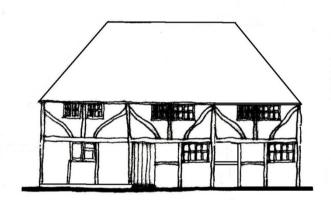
September Cottage: Sketches of the existing elevations by Folkes Architects
